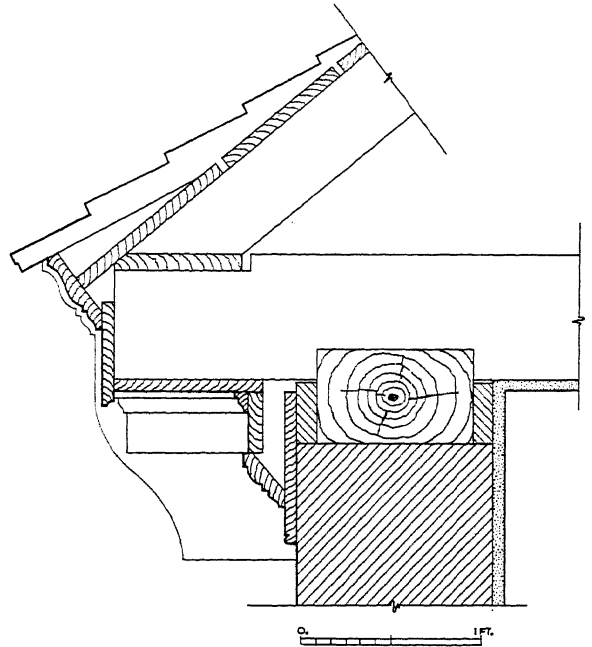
EAVES DETAIL OF A BRICK HOUSE.
